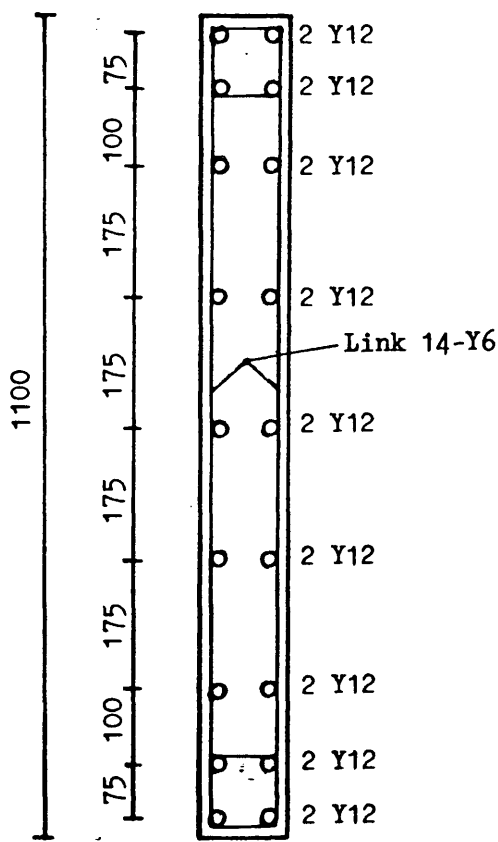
A horizontal section in the wall of model MS6 showing the reinforcing details
